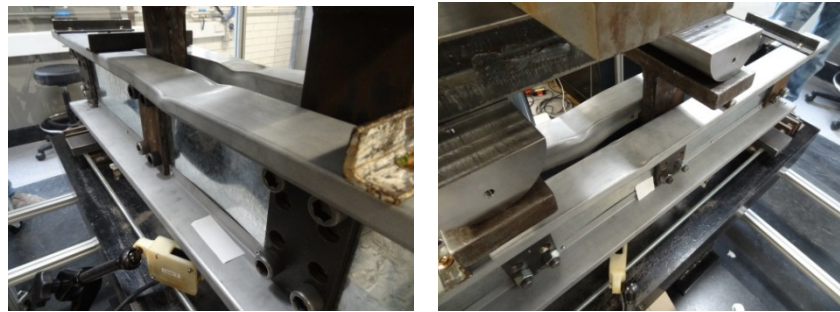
Typical Failure Mode of Rivet Fastened-RHFCBs
